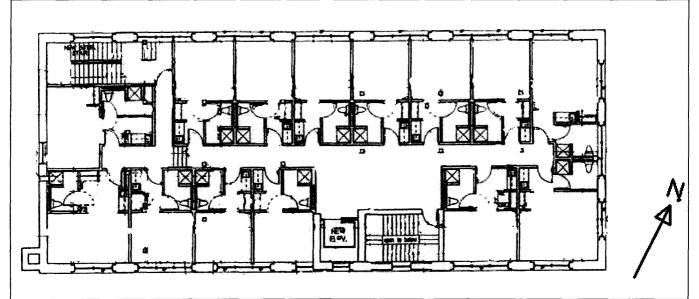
Current third floor plan (note the stair transition, west end of hall) (Ben E. Allers, P.C. Architect, September 1994)
